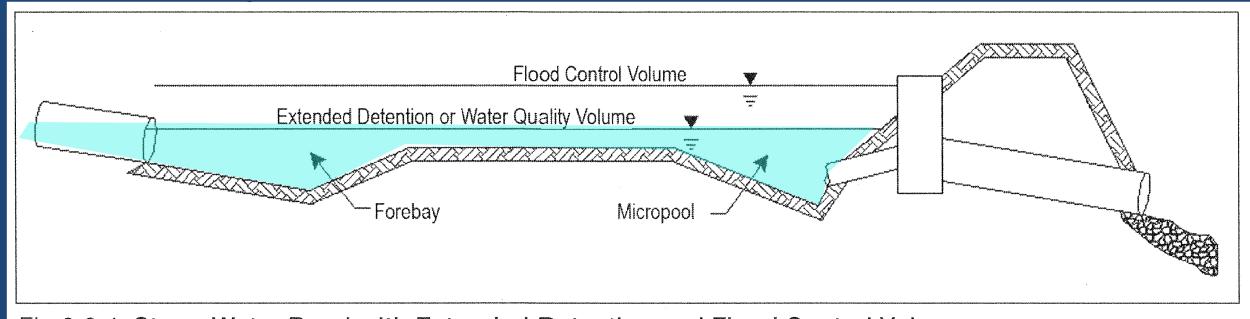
Storm Water Pond with Extended Detention and Flood Control Volumes
